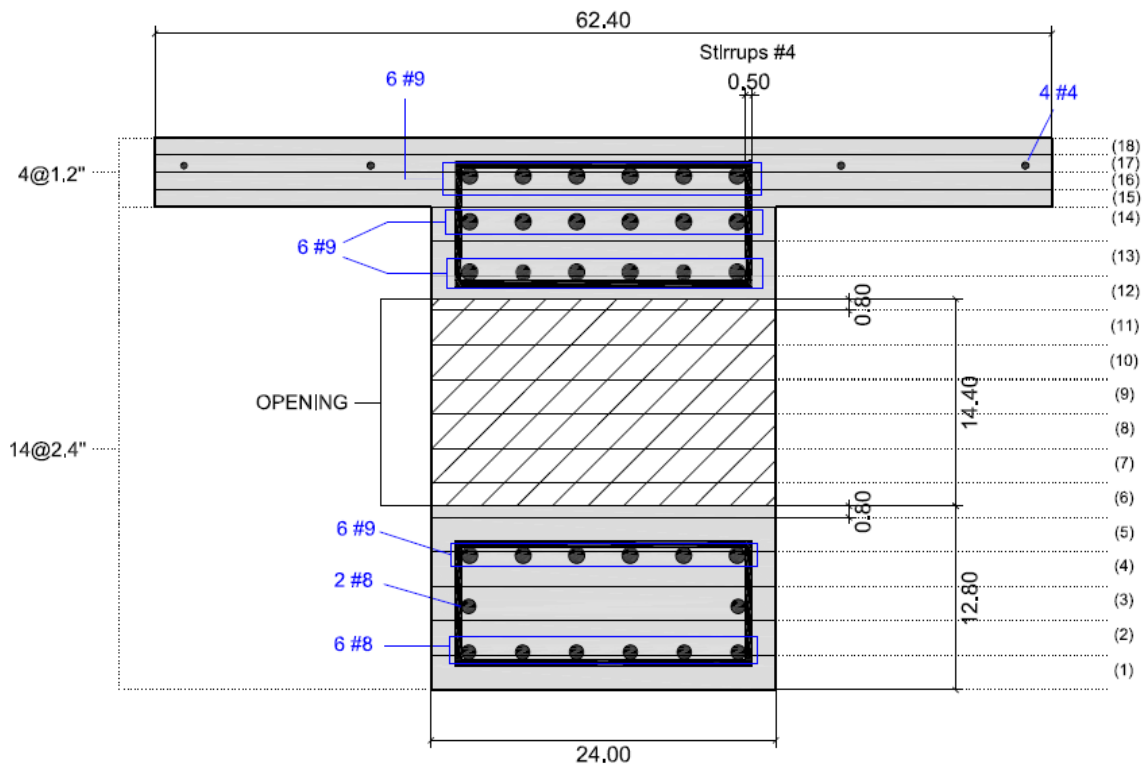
Cross section 5 for Specimen 2. Dimensions in inches.
